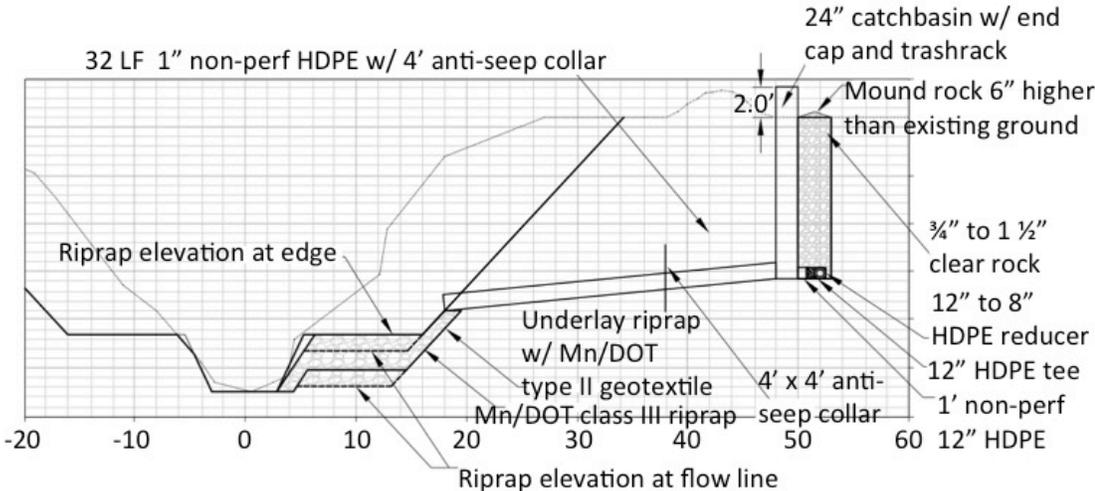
Cross-Section of the Two-Stage Ditch Showing the Rock Trench Side Inlet Structure. Dimensions of the Axis are Given in Feet. Drawing by Joel Peterson.
